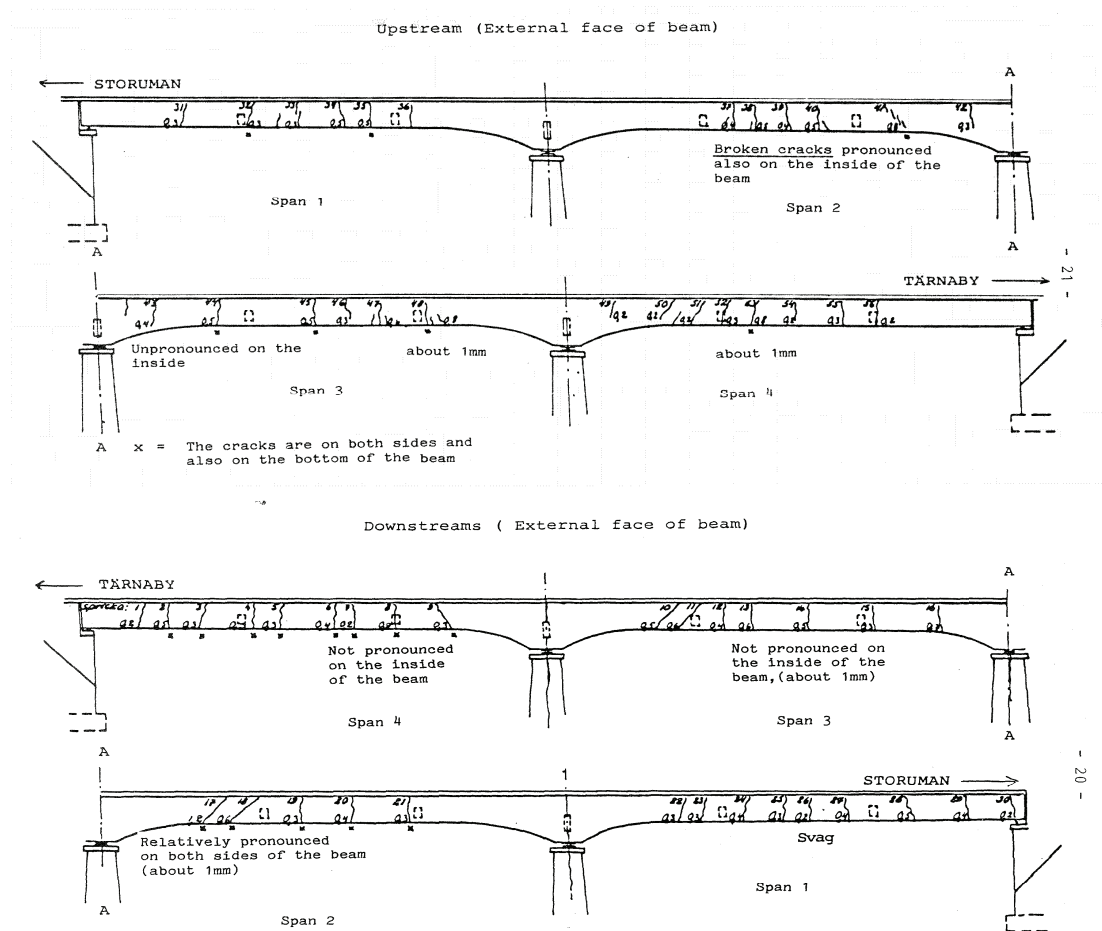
Recorded cracks in main concrete beam with 4 spans. Road E79, Bridge Ume River at Tärnafors, Tärnaby-Storuman, CEB (1988).
